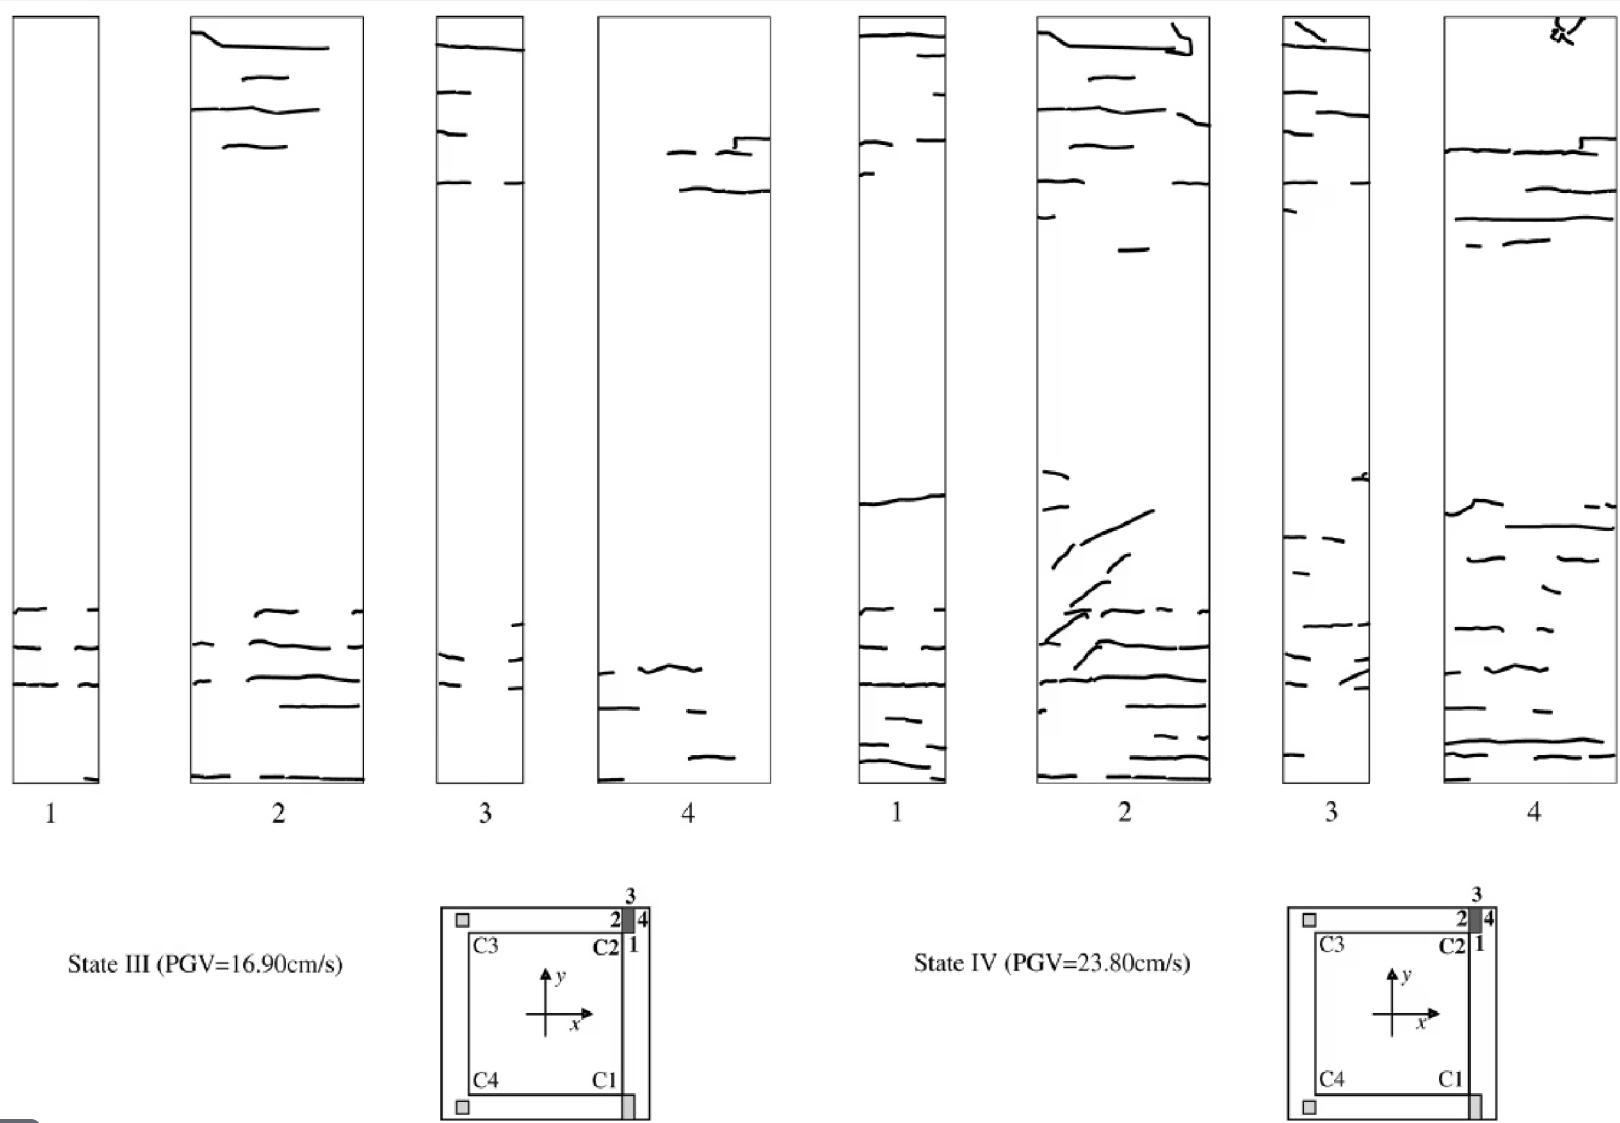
Damage of column no. 2 of frame no. 2 after excitation at level of 9 dB (State III).
